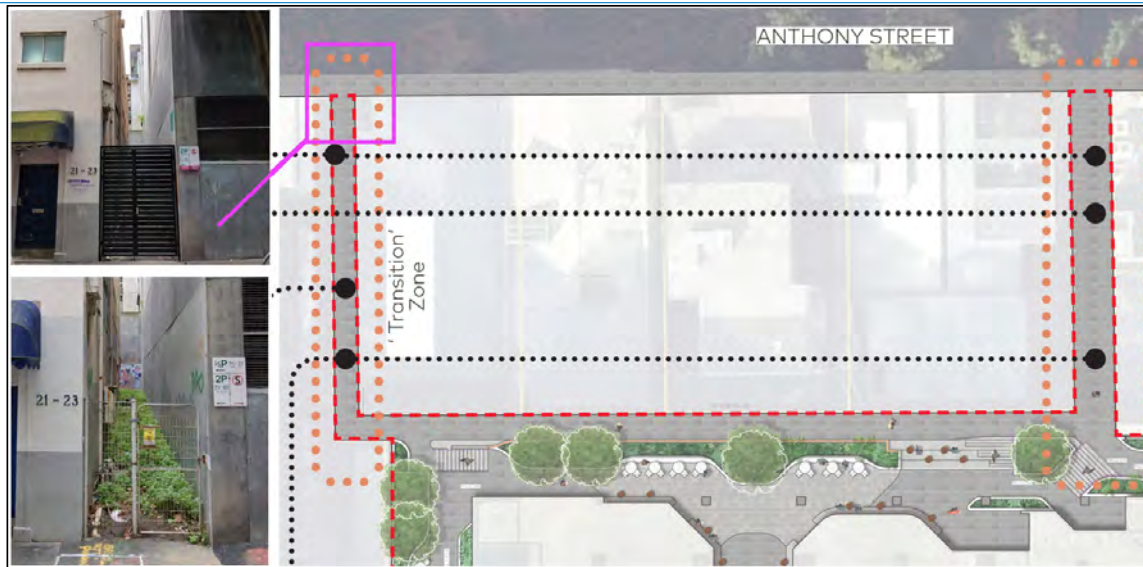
Northern easement and proposed connection to Anthony Street (Source: Application, dated June 2025, bottom photo from Google, dated May 2022, showing previous gate and top photo Planning Officer, dated November 2025, showing current conditions)
